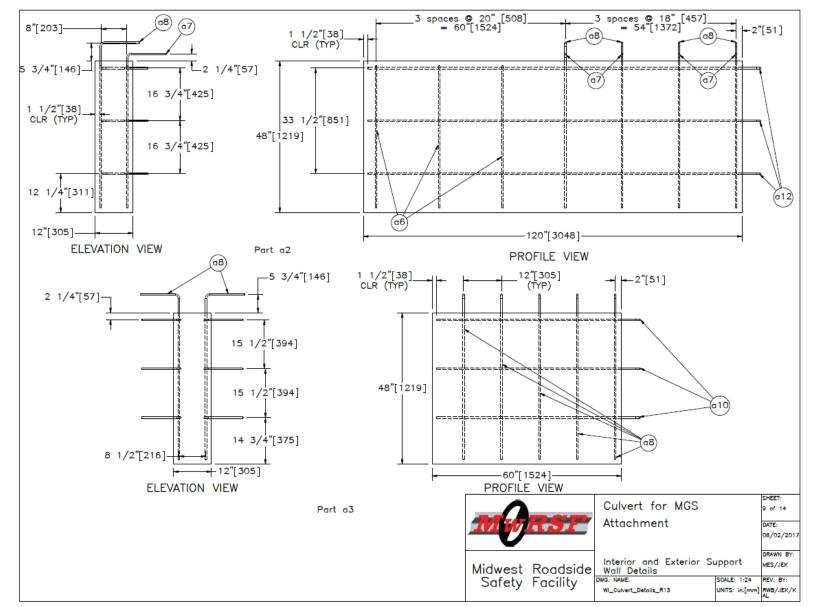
Interior and Exterior Support Wall Details, Test Nos. CMGS-1 and CMGS-2
